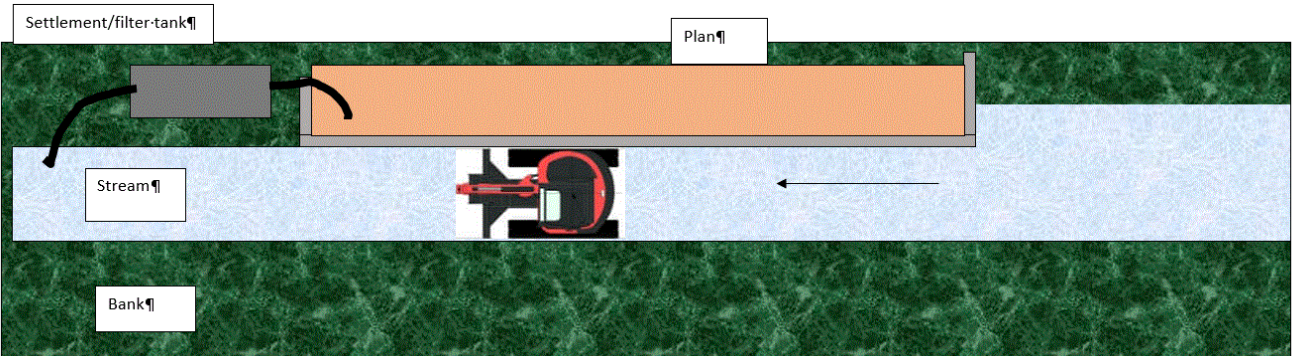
Sediment Filter and Sheet Piling, General Arrangement
